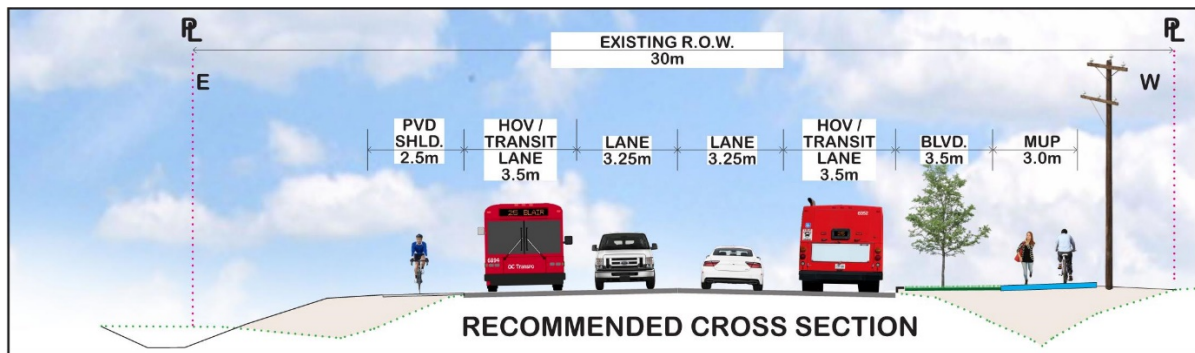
Typical Blair Road Cross-Section (South of OR174)
